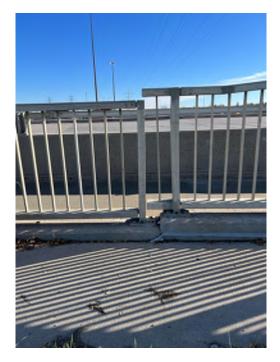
Pedestrian handrail at NW corner showing differential settlement (~80mm)
